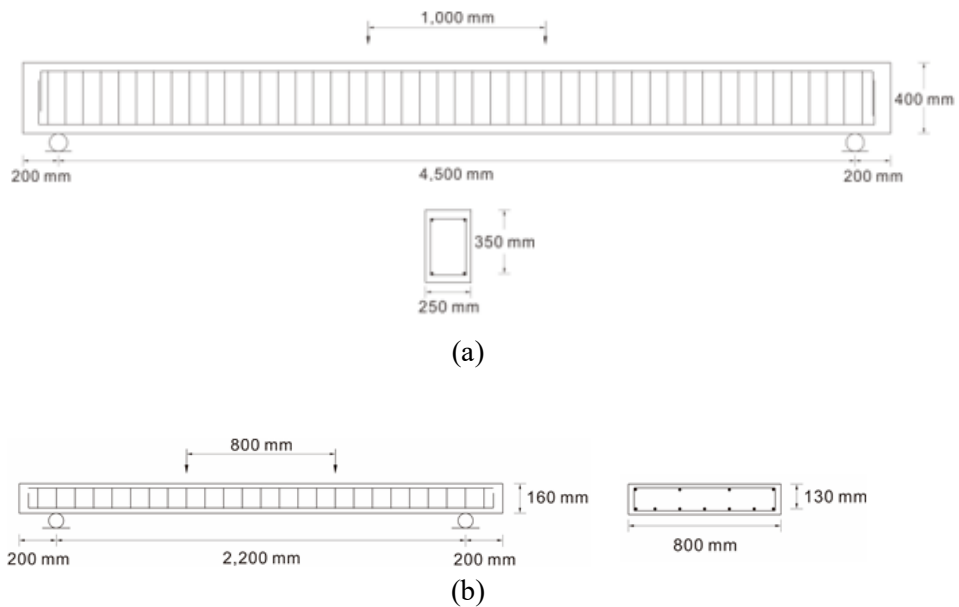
Test specimens; (a) RC beam; (b) One way slab
